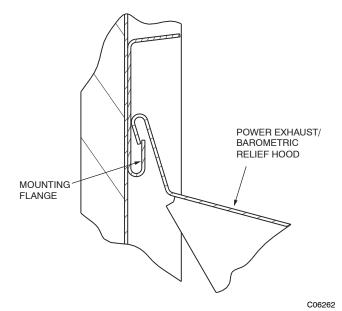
Barometric Relief/Power Exhaust Hood Flange
